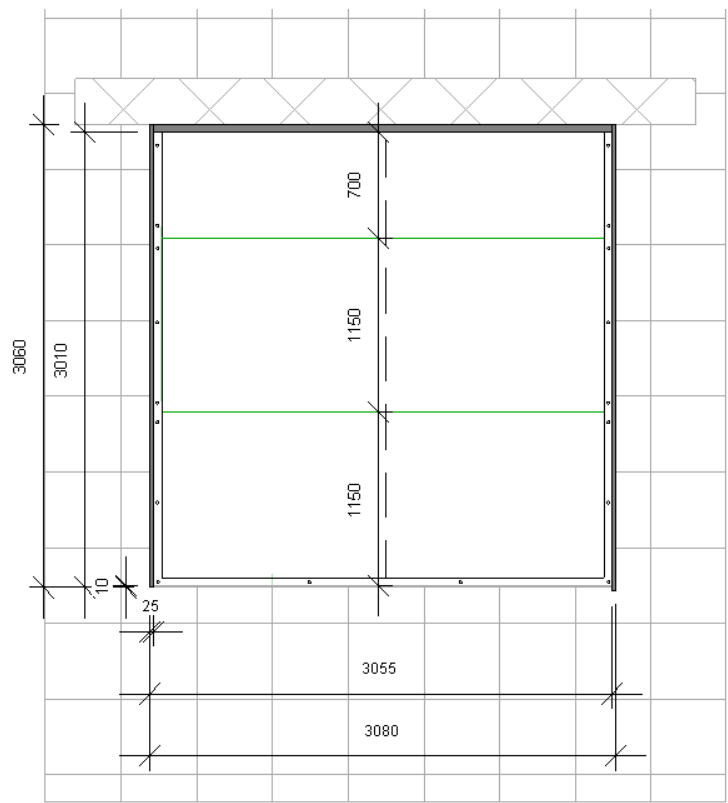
Front view of the assembly of the first sandwich panel wall – Test 3'.
